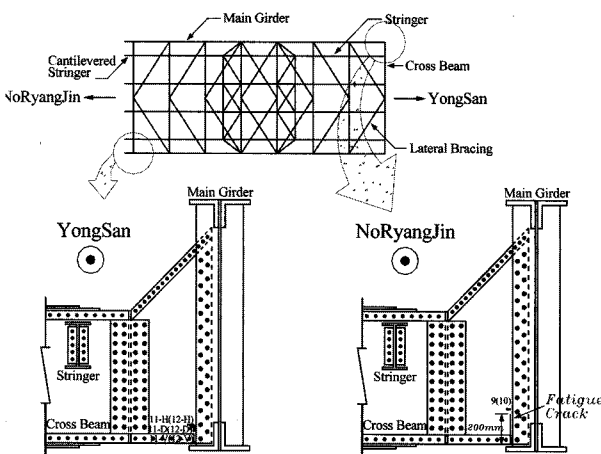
Gauge attachment points in the connection between main girder & cross beam.
